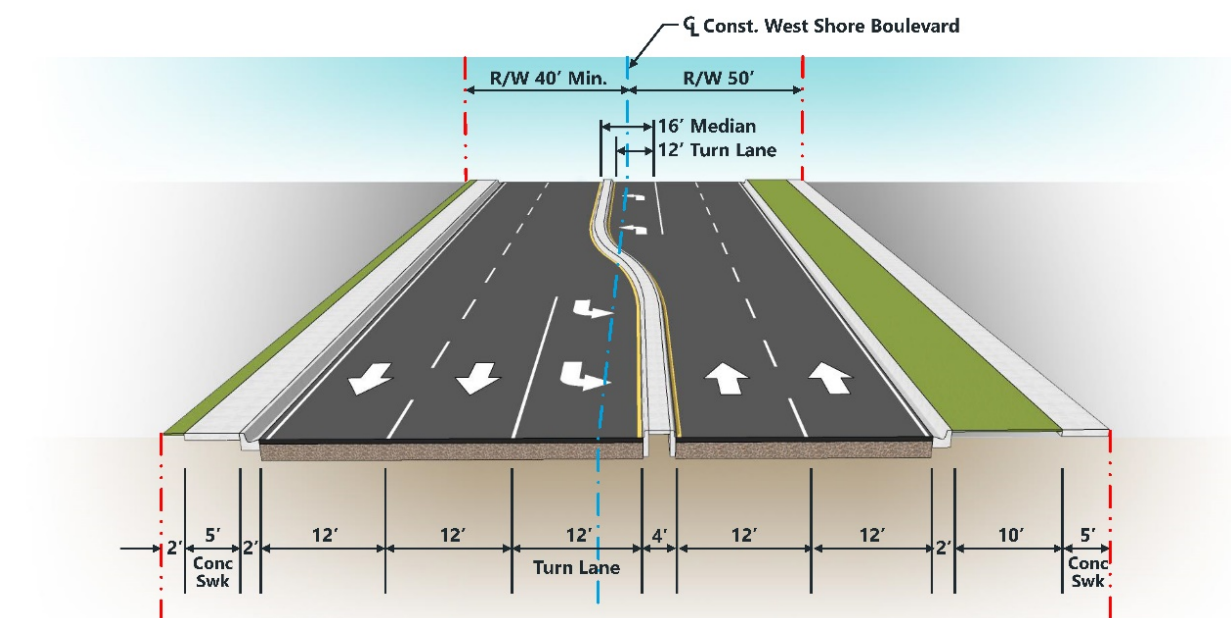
Existing Typical Section Looking North from I-275 (SR 93) to W. Cypress Street
